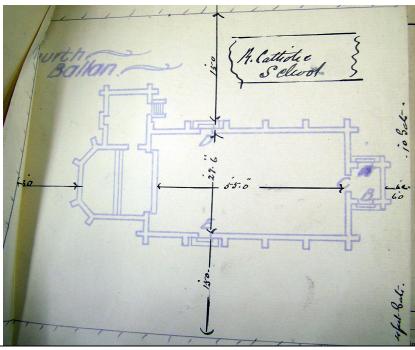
Board of Public Health, Floor Plan of St. Brigid's Church, n.d. [c,1913]. Source: 'Roman Catholic Church, Ballan', public building file, VPRS 7882 Unit 4610, PROV.
